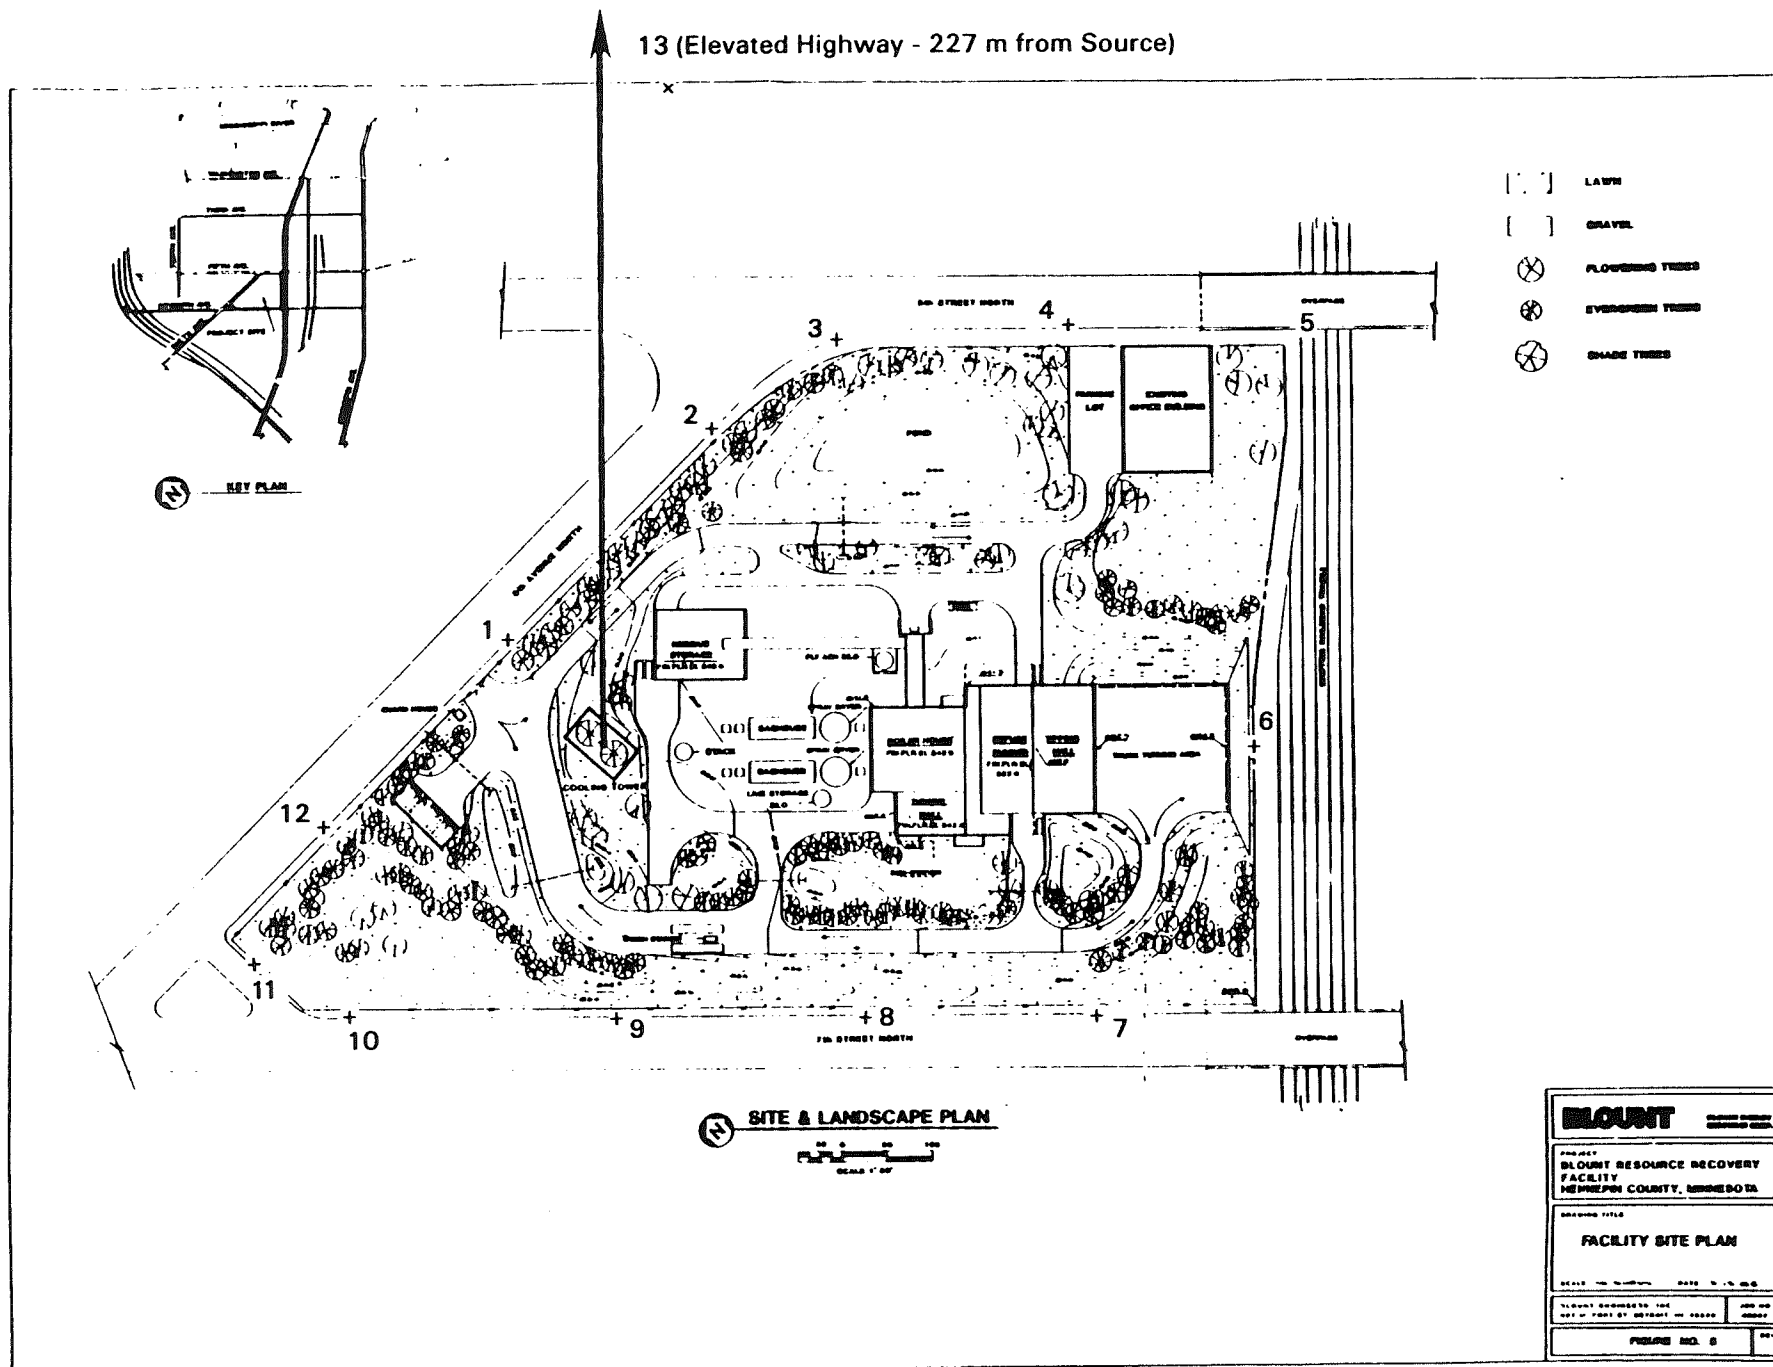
Receptor Locations for Cooling Tower Plume Modeling, Assuming that the Cooling Tower Building is the Controlling Building
